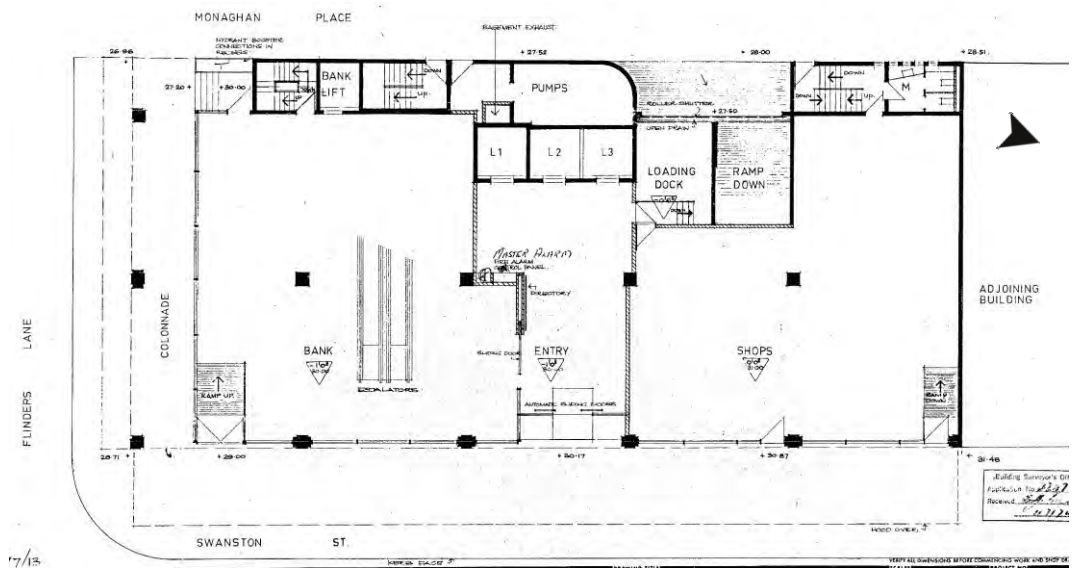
Ground floor plan. Drawing by Buchan, Laird & Buchan, dated April 1971 (BAP).
